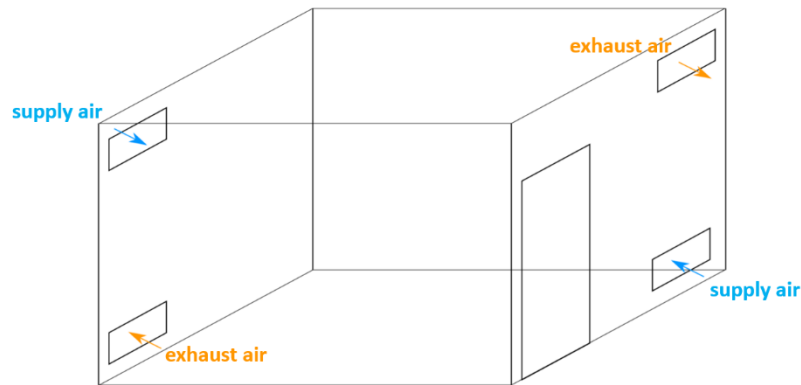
Schematic view of the connection of the test room with the ventilation system.
